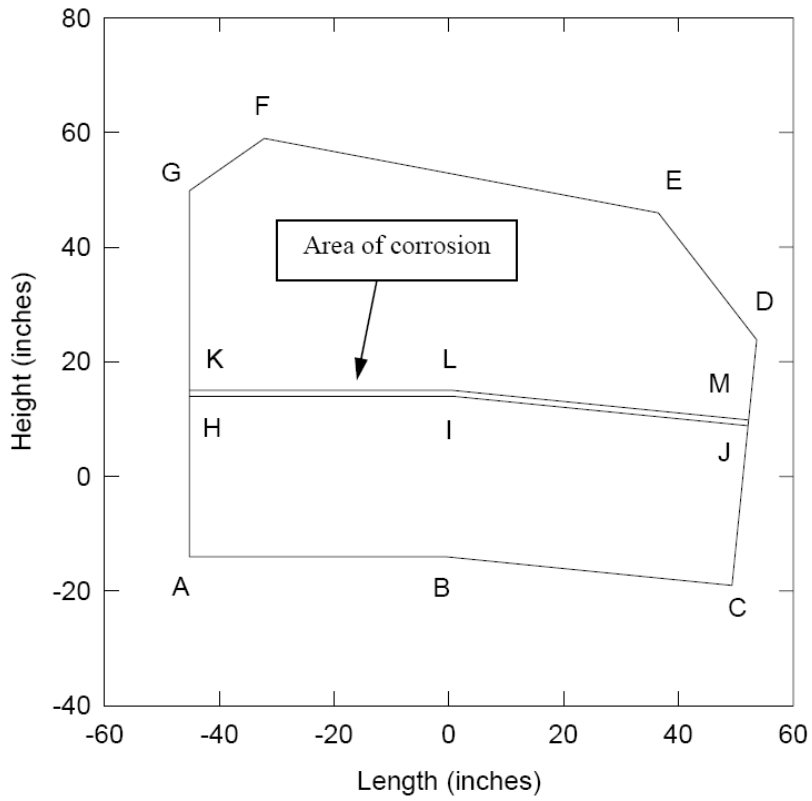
Illustration of corroded area in the west gusset plate at the L11W joint; provided by NTSB ^[3, 4] (gusset, side plate and cover plate of the lower chord box beam without fillet weld)
